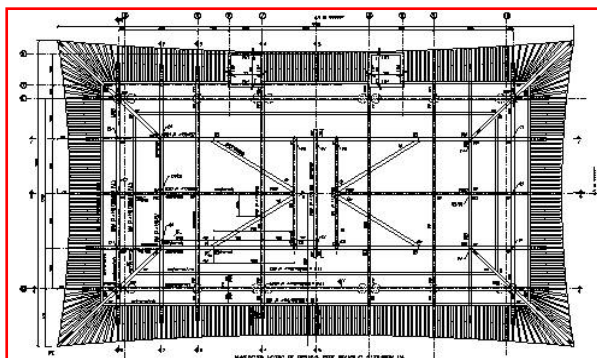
Plan showing the beam arrangement for Oriental roof Completed view
